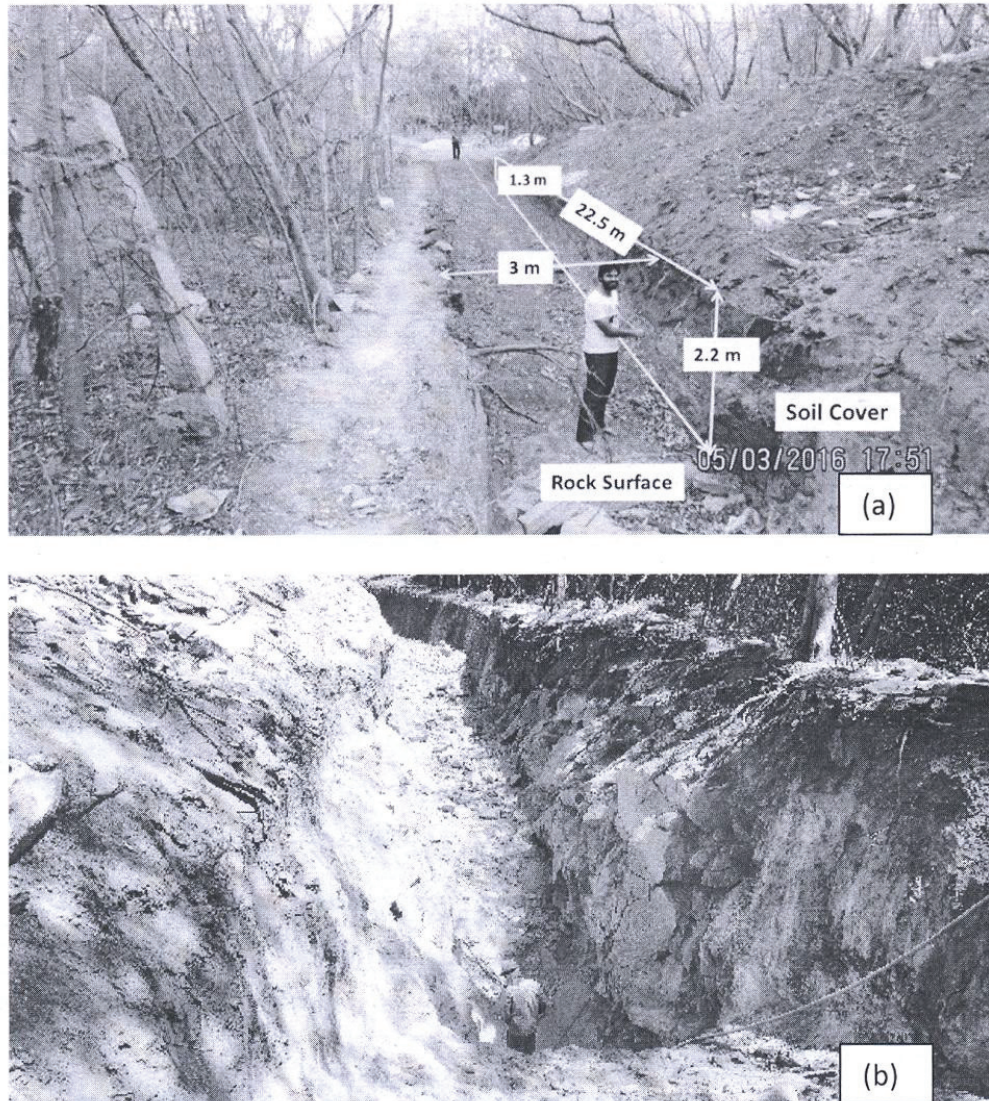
(a) On-site actual cut-section from point A to B after removal of overburden and (b) Lithomeric section A-B post excavation
